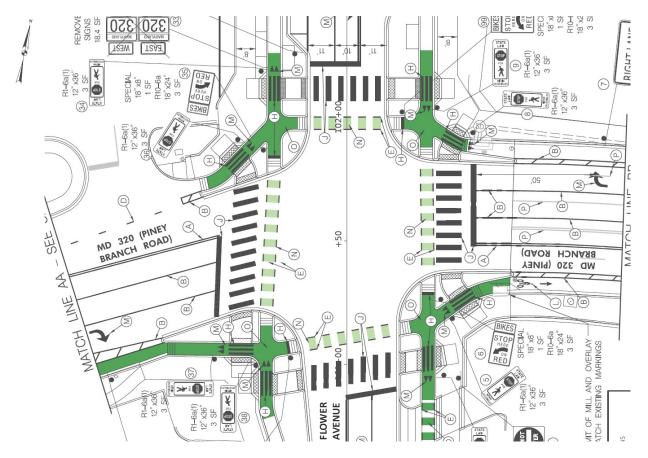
Current Piney Branch Road/Flower Avenue Protected Intersection Design
